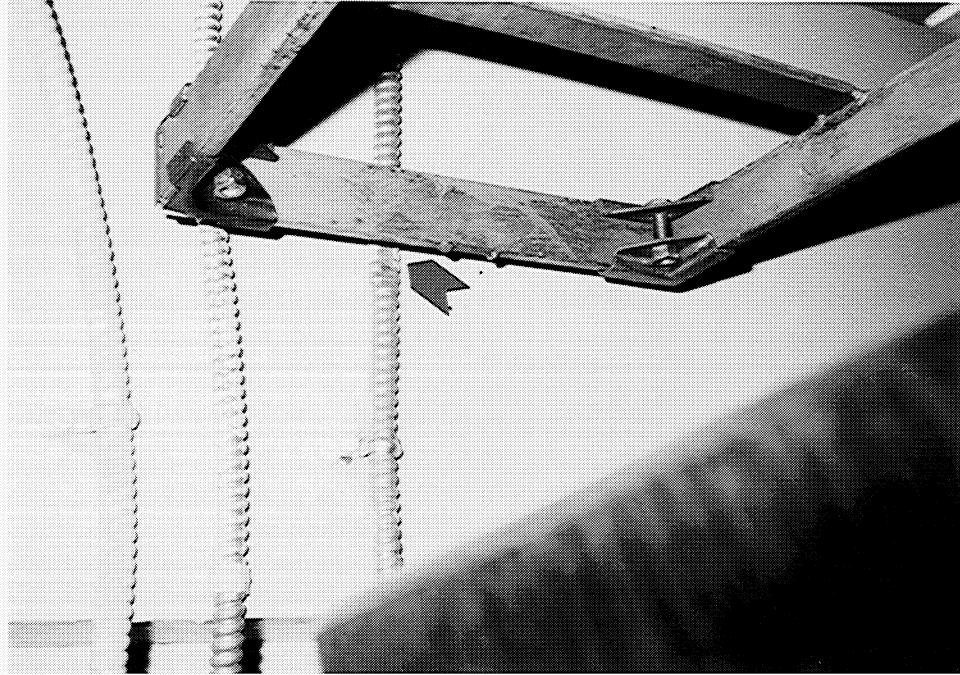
The motion of the framing system, which exceeded 10 inches, crushed electrical conduit mounted on the wall of the equipment room.
